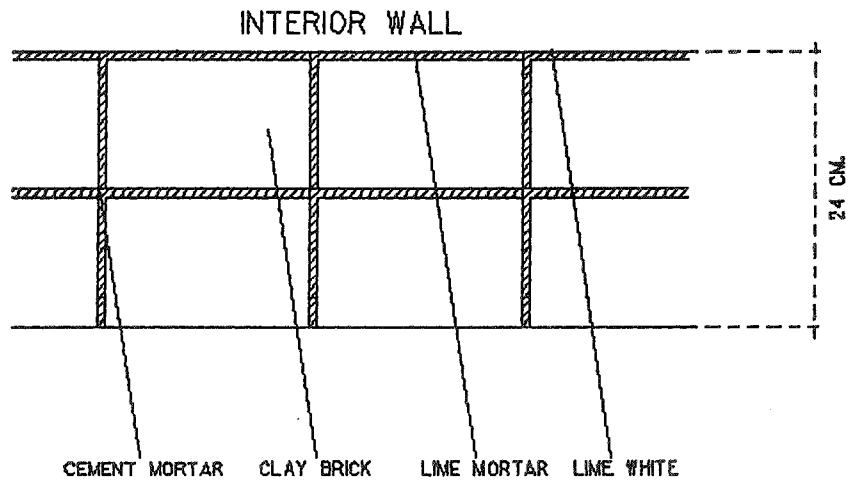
TYPICAL HENAN WALL: HORIZONTAL PROFILE
